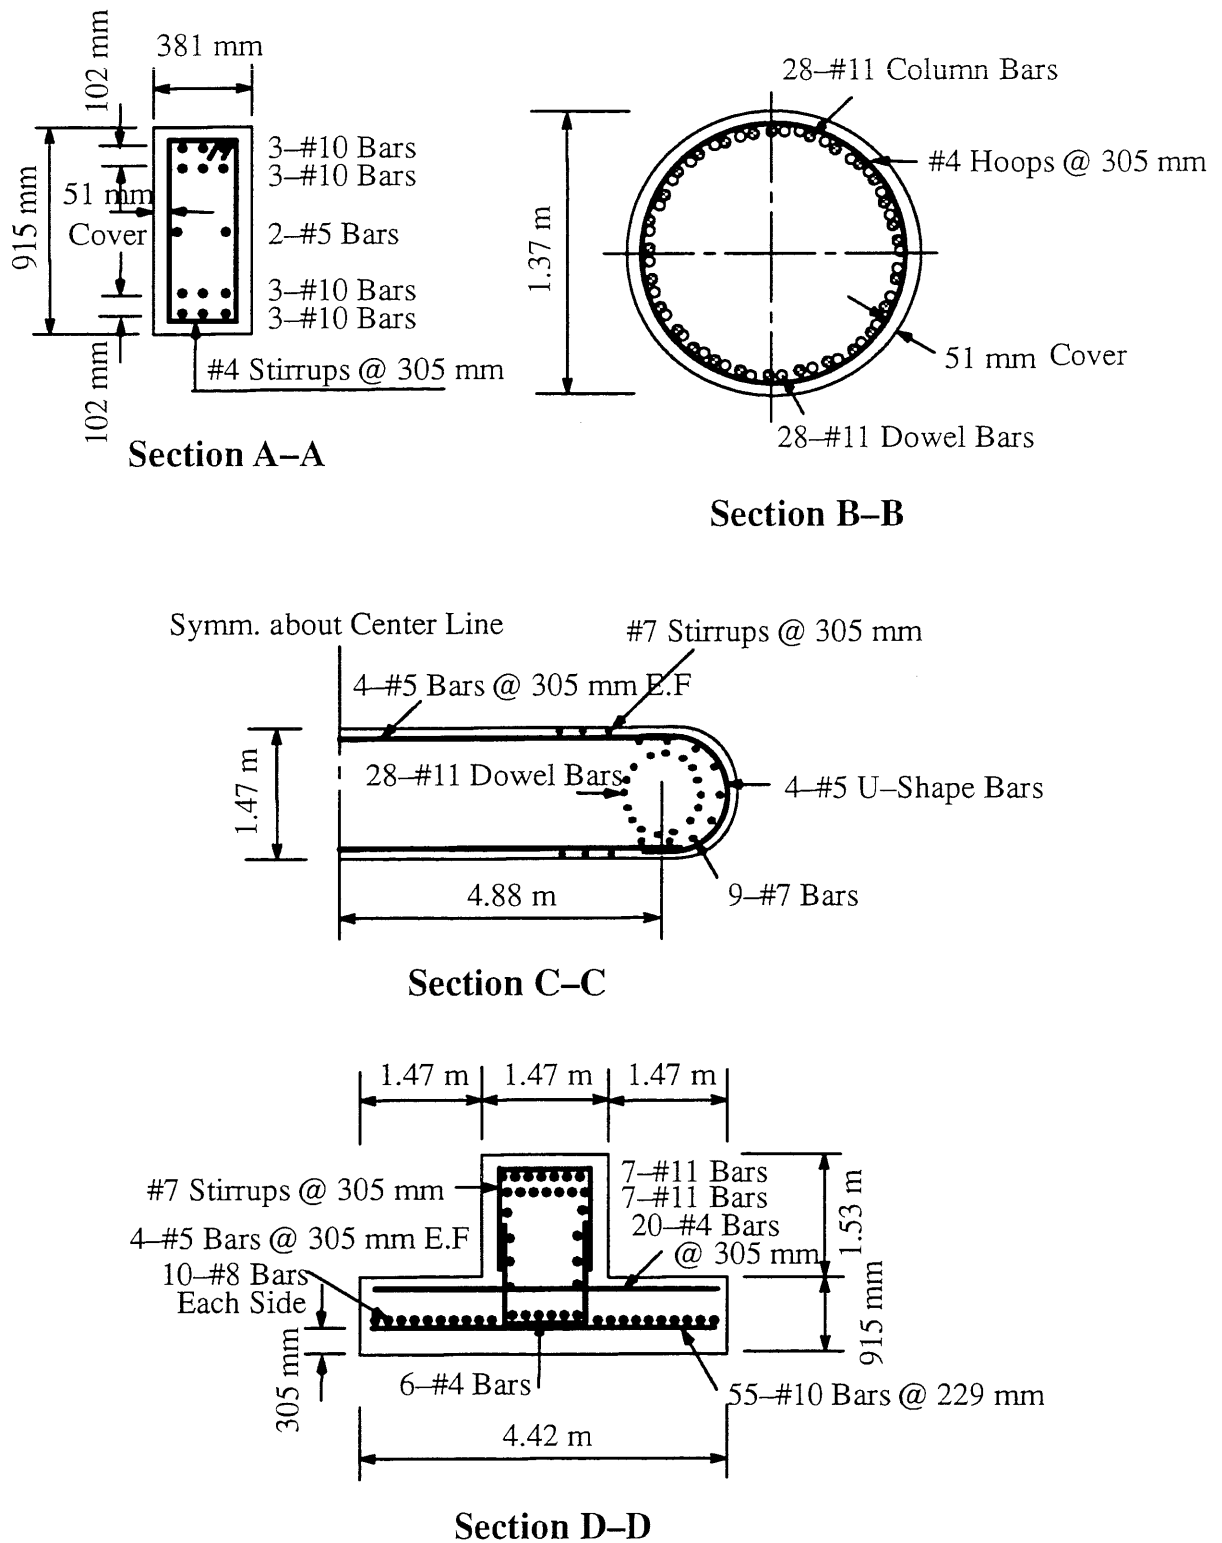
Reinforcing Details for Characteristic Pier with 1.37 m (54 in.) Columns
